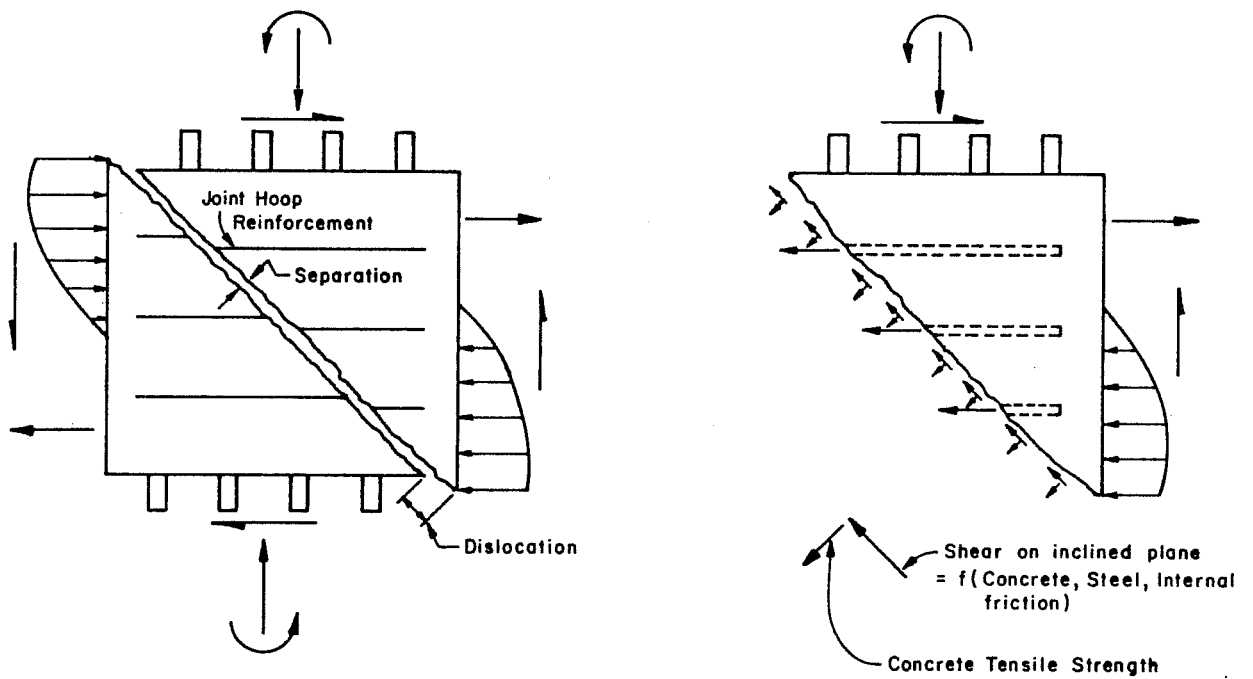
Joint hoop reinforcement considered as tying reinforcement for shear friction
